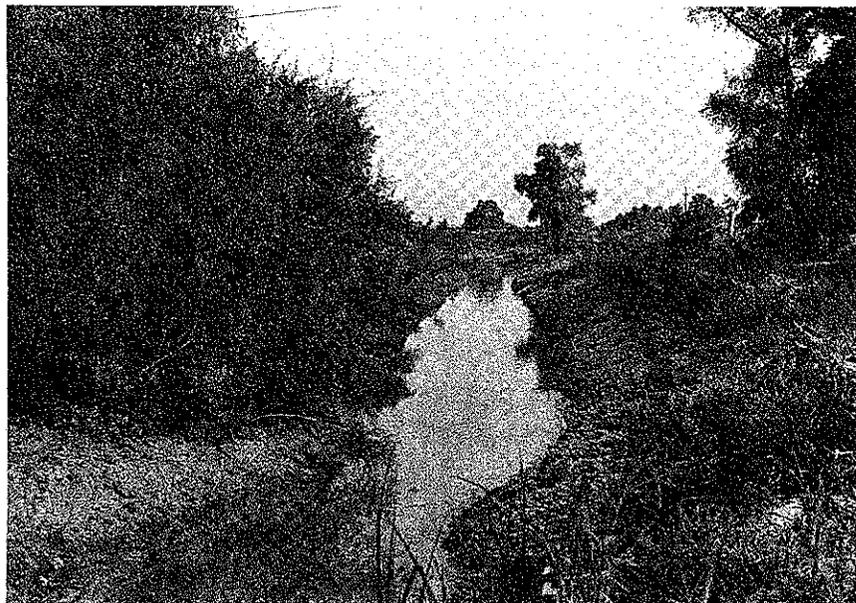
Onsite drainage ditches can be used to facilitate flushing of borrow pits
